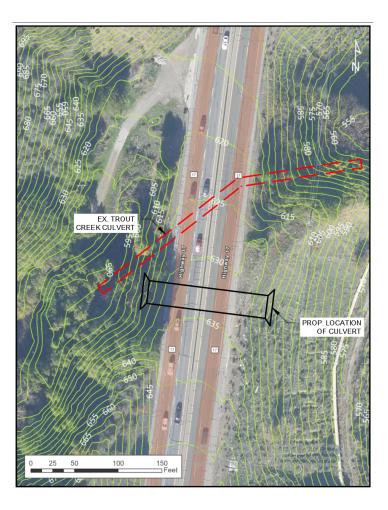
Location of existing Trout Creek box culvert in comparison to proposed location of the wildlife crossing culvert.
